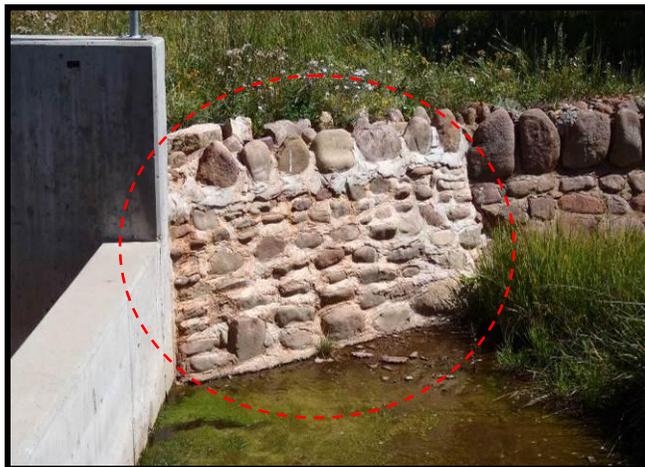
Repaired or reconstructed section of pond wall adjacent to the water supply station. View to the east of the east wall.
